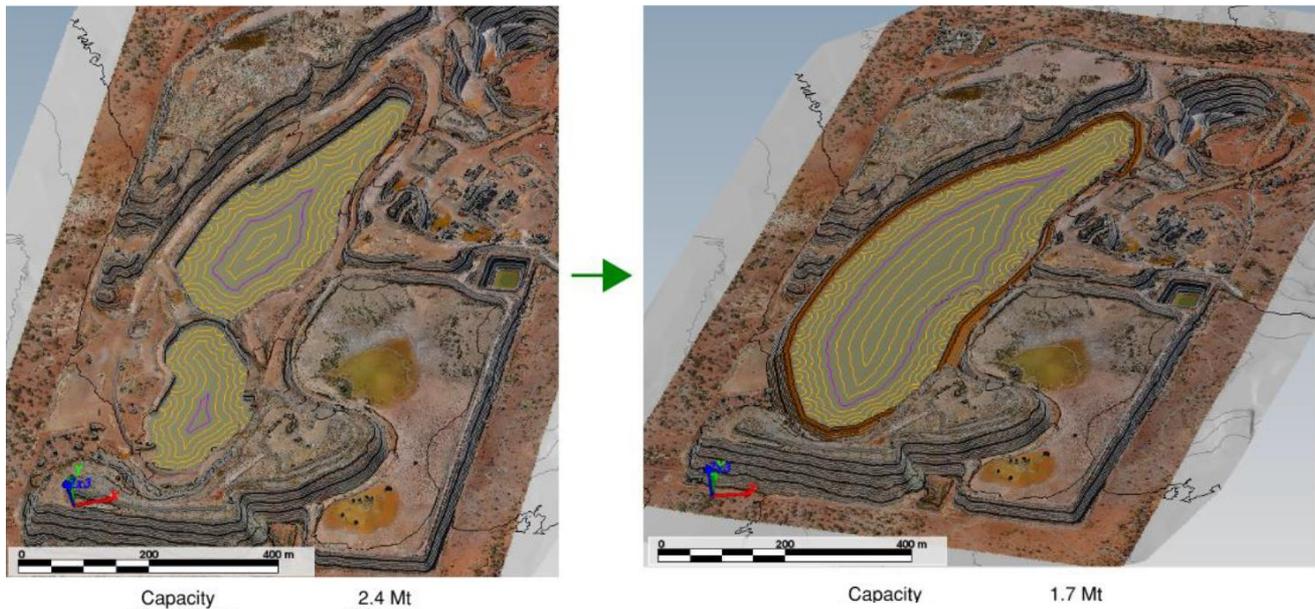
Beta IPTSF & Embankment development (WSP, 2025)
